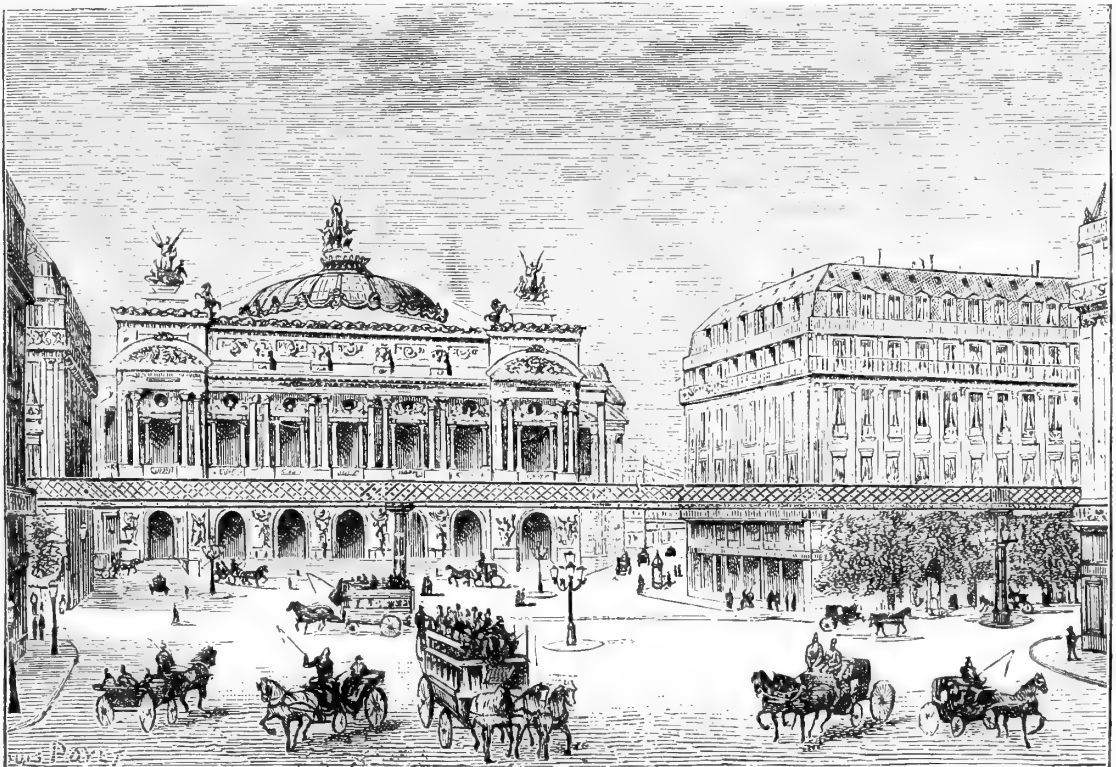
PLAN OF THE ELECTRIC ELEVATED ROAD. VIEW BEFORE THE GRAND OPERA OF PARIS.
